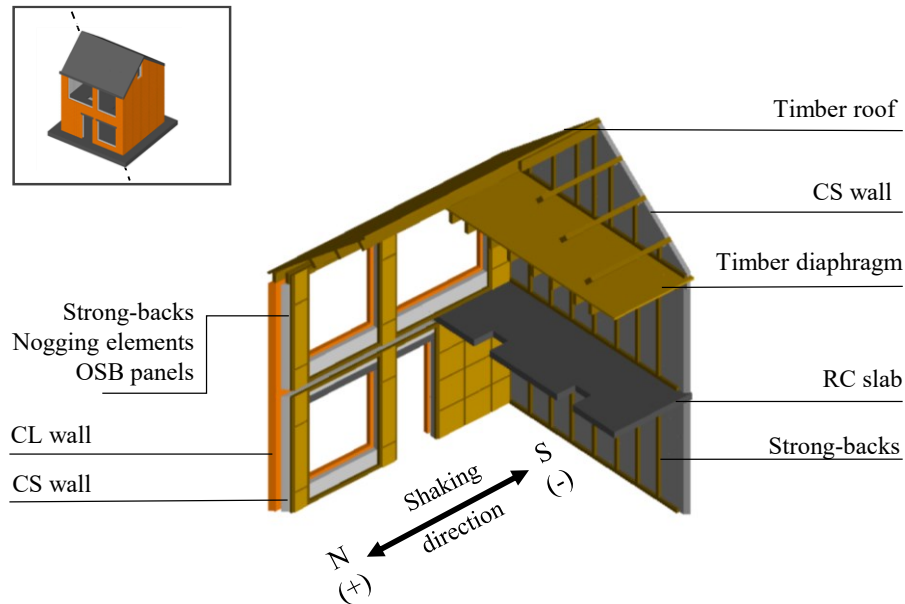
3D view of the retrofitted building specimen EUC-BUILD7
